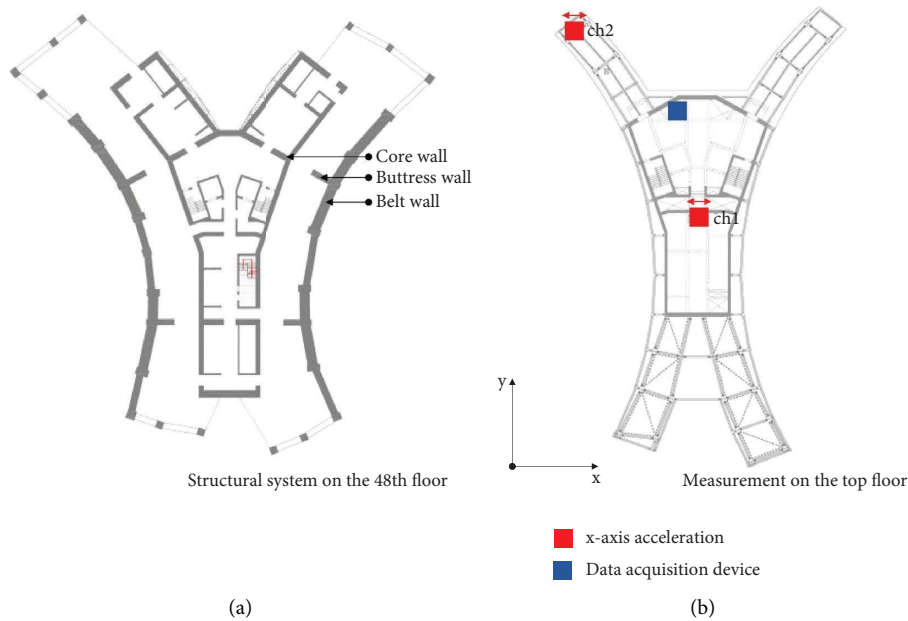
Plan view and measurement location: (a) 48th floor and (b) top floor.
